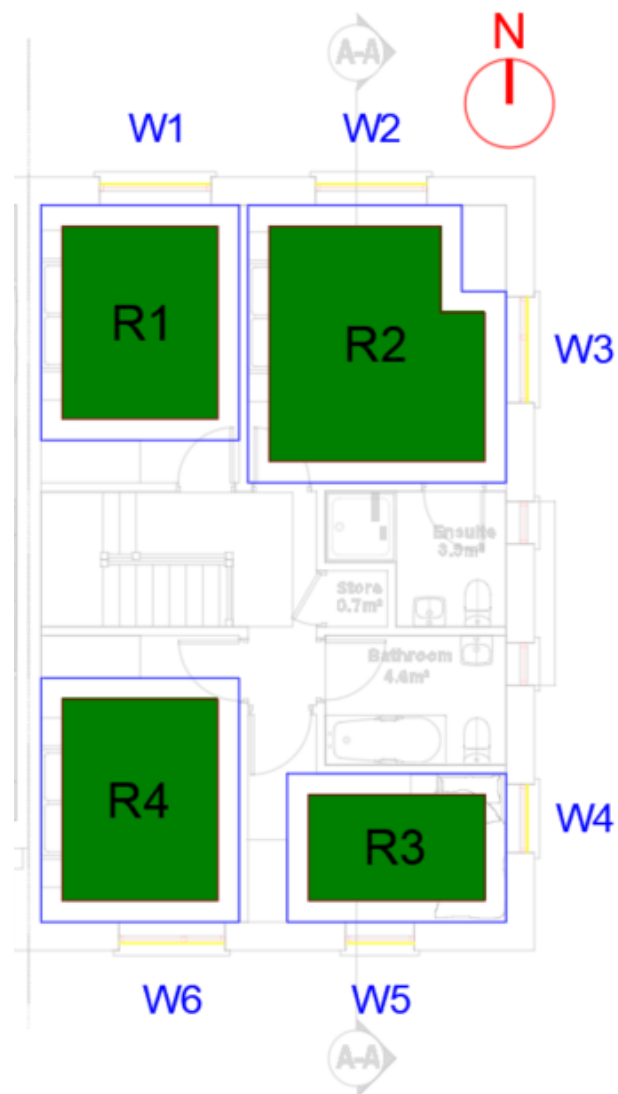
Proposed First Floor sDA Contours of House B-02 2-056
